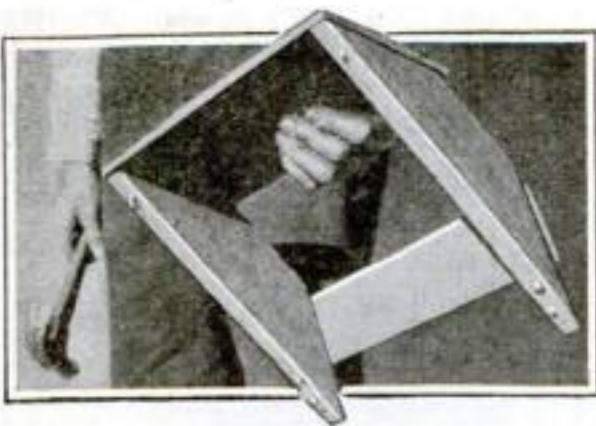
A roof jack is of great assistance in working on a shingled roof
